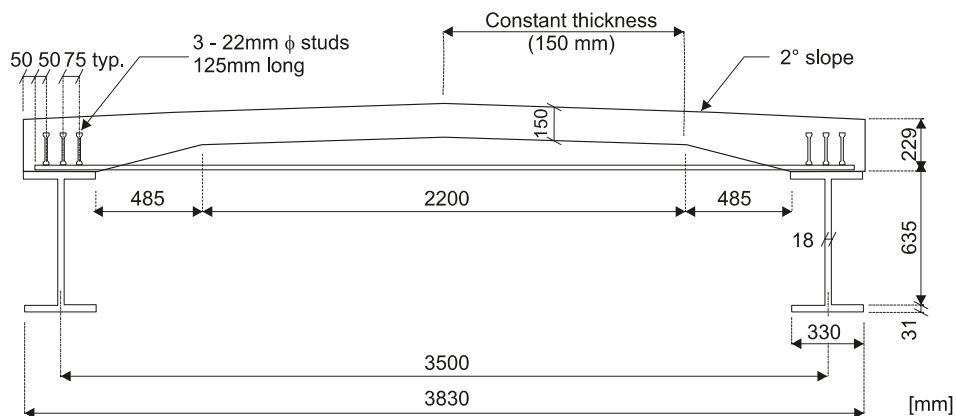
Typical Cross-Section of Arch-Panel on Steel Support Beams
